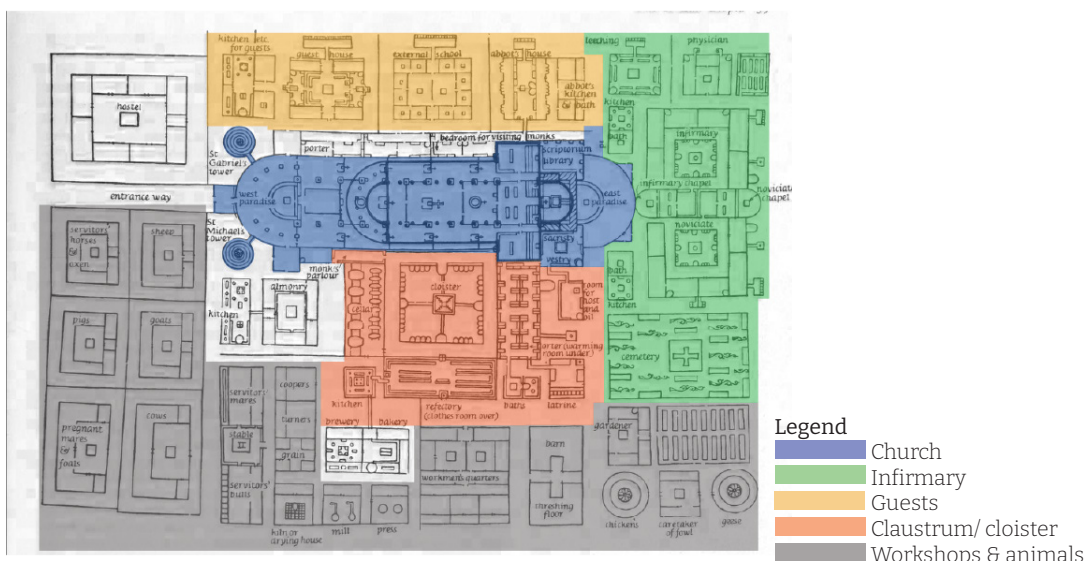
The Plan of St. Gall redrawn: The four zones & the church highlighted.
